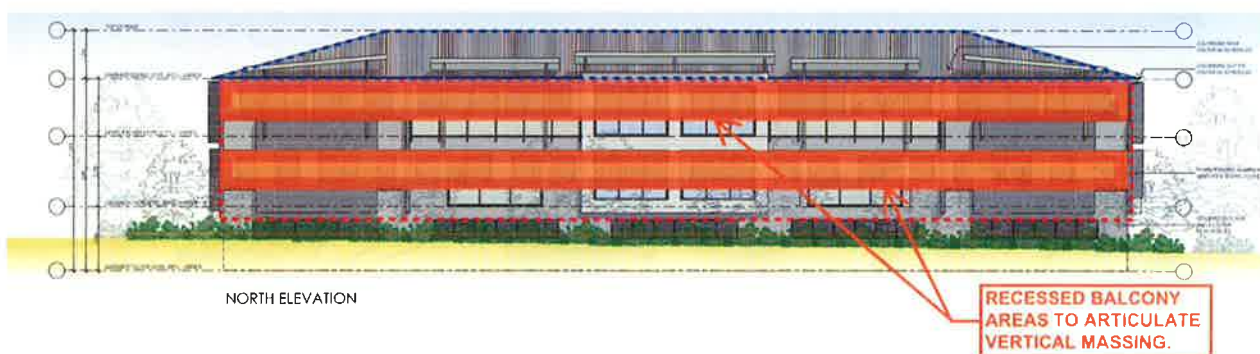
Typical Apartment Block North Elevation Contextual Elements
